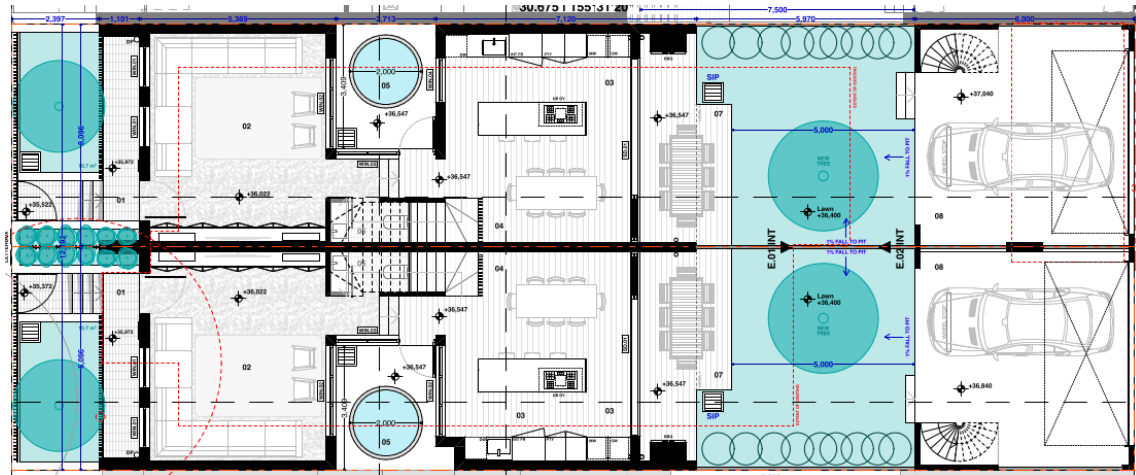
Ground floor plan of proposed development showing location of principal living area and principal area of private open space.
